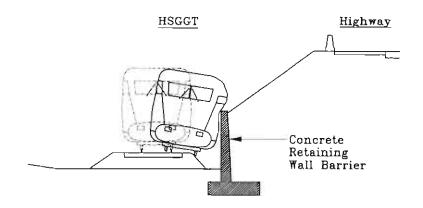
COMBINATION BARRIER - RETAINING WALL
